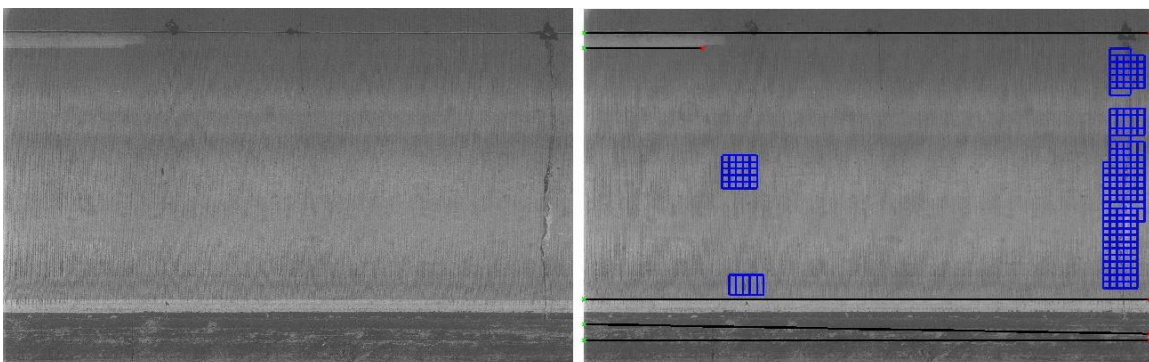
Example 3 of concrete crack at high severity: raw crack (left) and crack detection (right)
